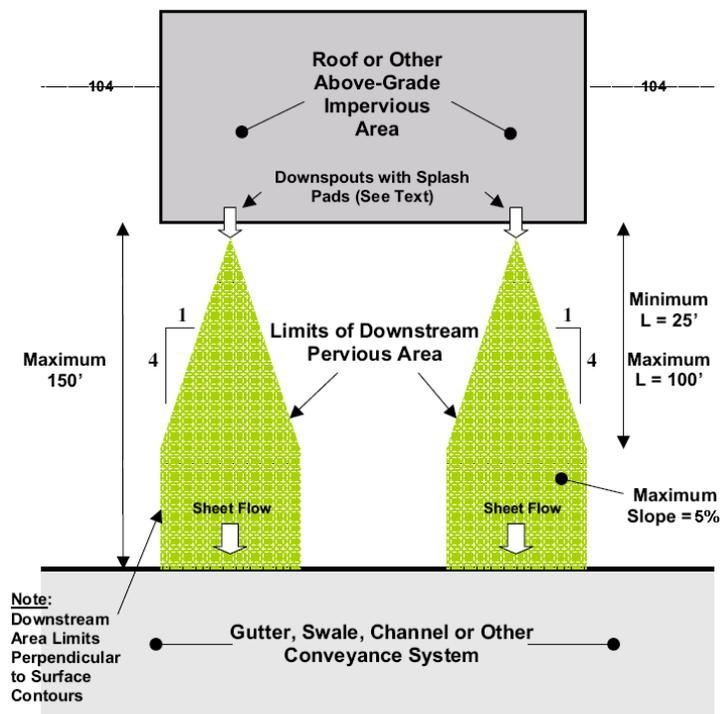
Standards for disconnecting impervious surface via downspouts. Source: New Jersey Department of Environmental Protection, 2005.
